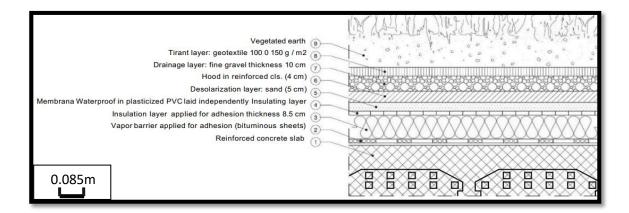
Walkable green roof detail. Source: (Author, June 2021)
